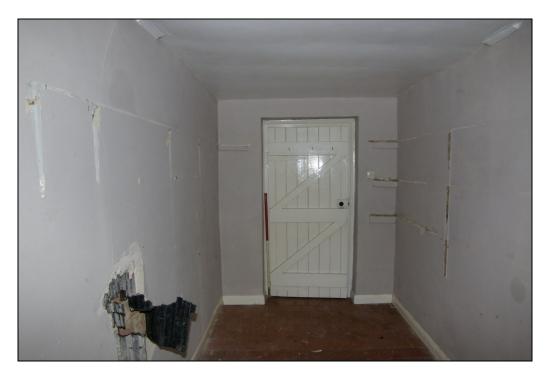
Pantry, with ledged and braced timber matchboard door, looking northwest.
